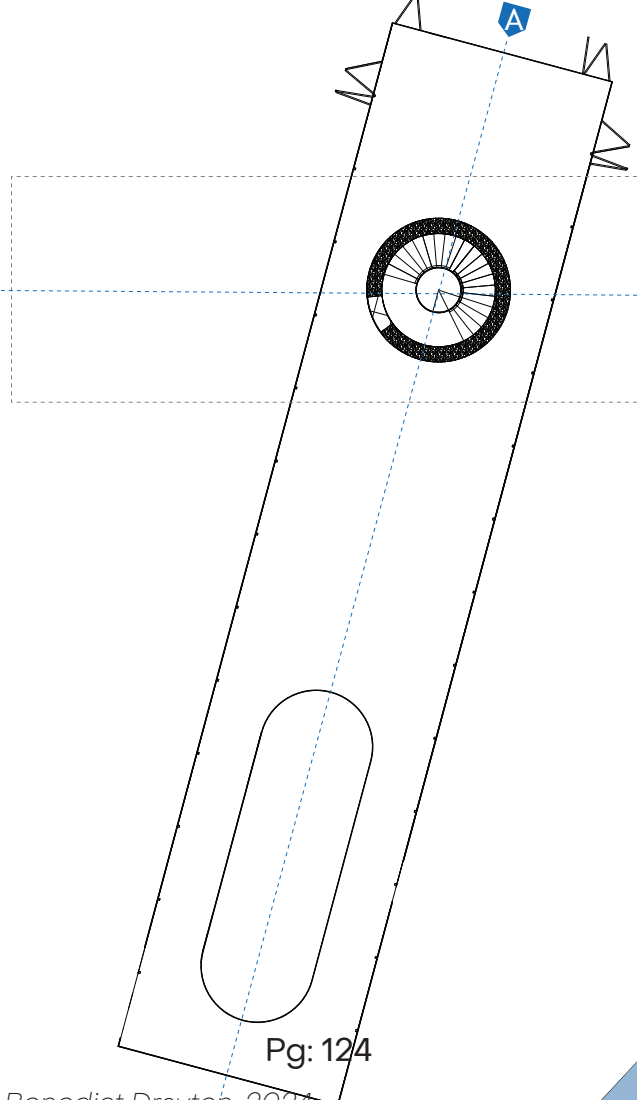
Anawhata Building: Plan 1, Benedict Drayton, 2024
